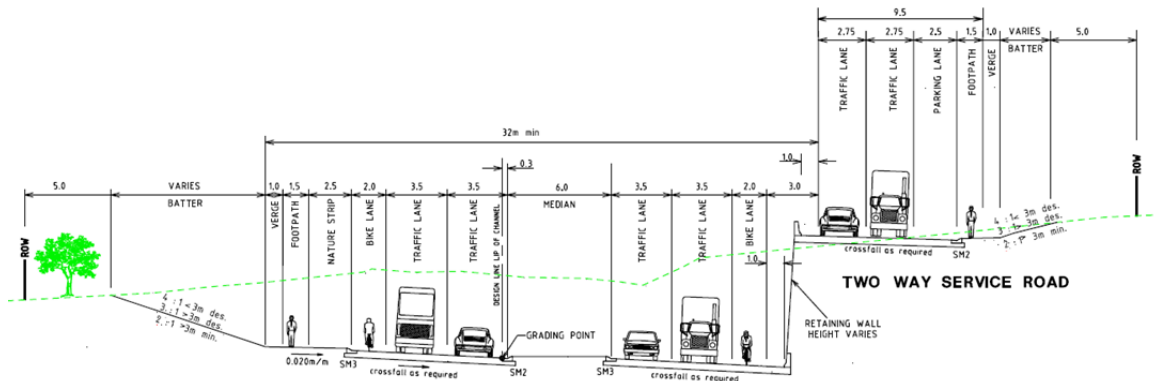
Typical cross section – Yan Yean Road Duplication (8)
